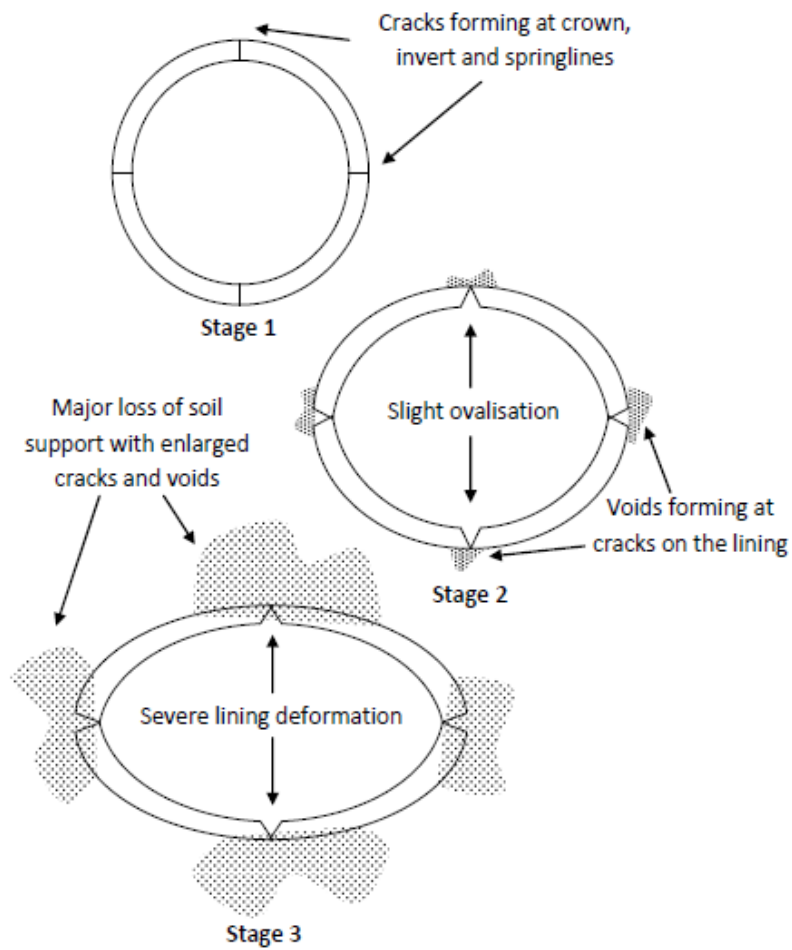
The stages of sewer pipe failure (Adapted from (Davis et al., 2005))
